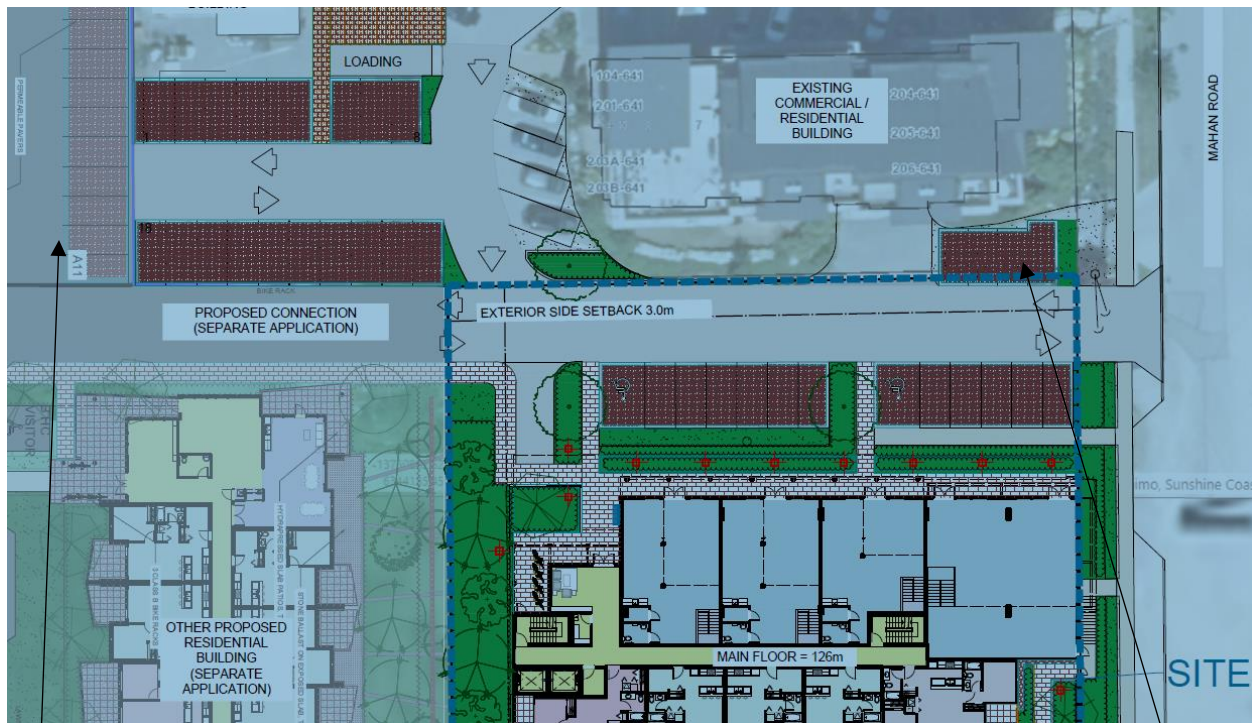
Excerpt of the site plan, showing the placement of the additional parking spaces.
